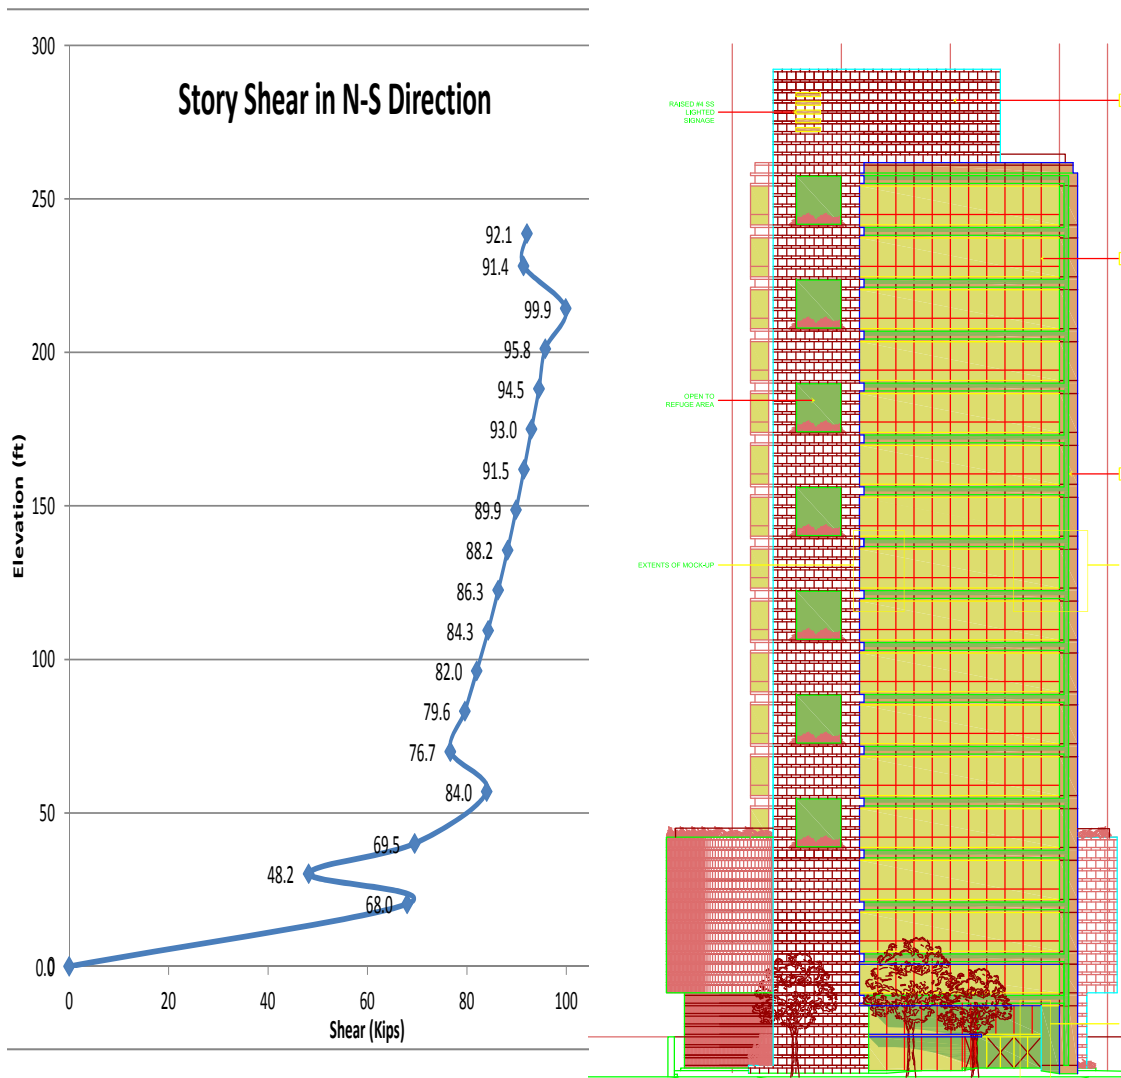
Story shear forces in N-S direction. The elevation shows east facade.
